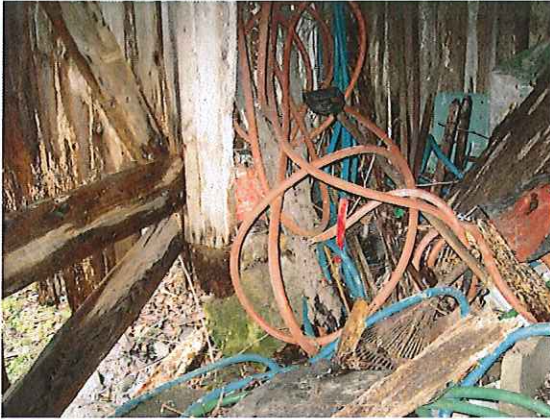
Condition at North East corner (5C). Note concrete foundation pier rolling outwards.
